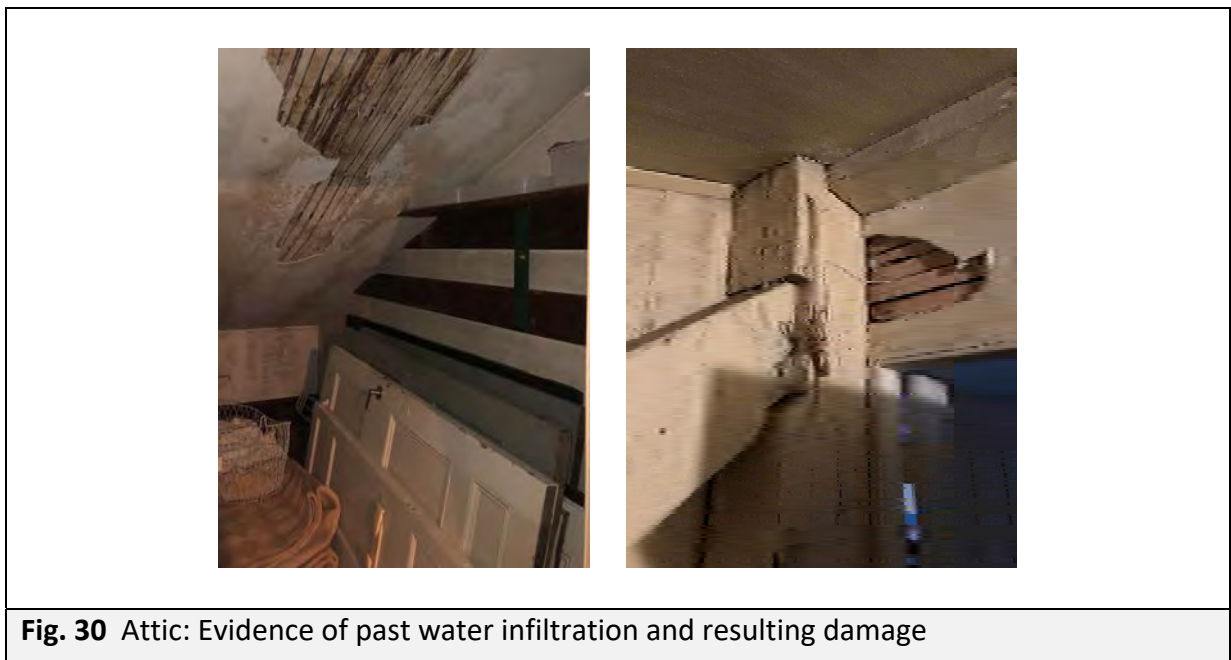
Attic: Evidence of past water infiltration and resulting damage
